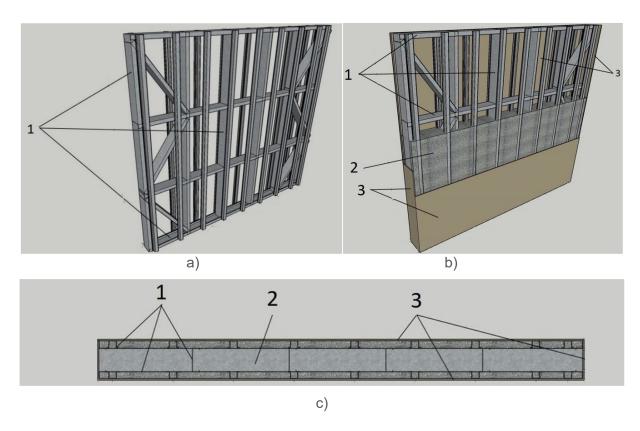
Schematic of a new composite wall made of expanded polystyrene concrete in a fixed formwork using light steel thin-walled structures: a) frame made of light steel thin-walled structures; b) general appearance of the wall, including all layers placed according to the arrangement technique; c) transverse (horizontal) section of the wall according to the installation technology. Conventional designations: 1 - frame with light steel thin-walled structures; 2 – expanded polystyrene concrete; 3 - cement chipboards
